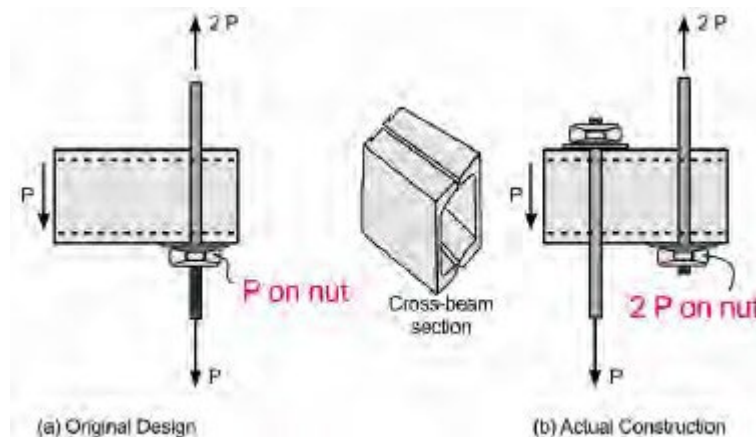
4th Floor Atrium Walkway Box Beam Connection Detail
